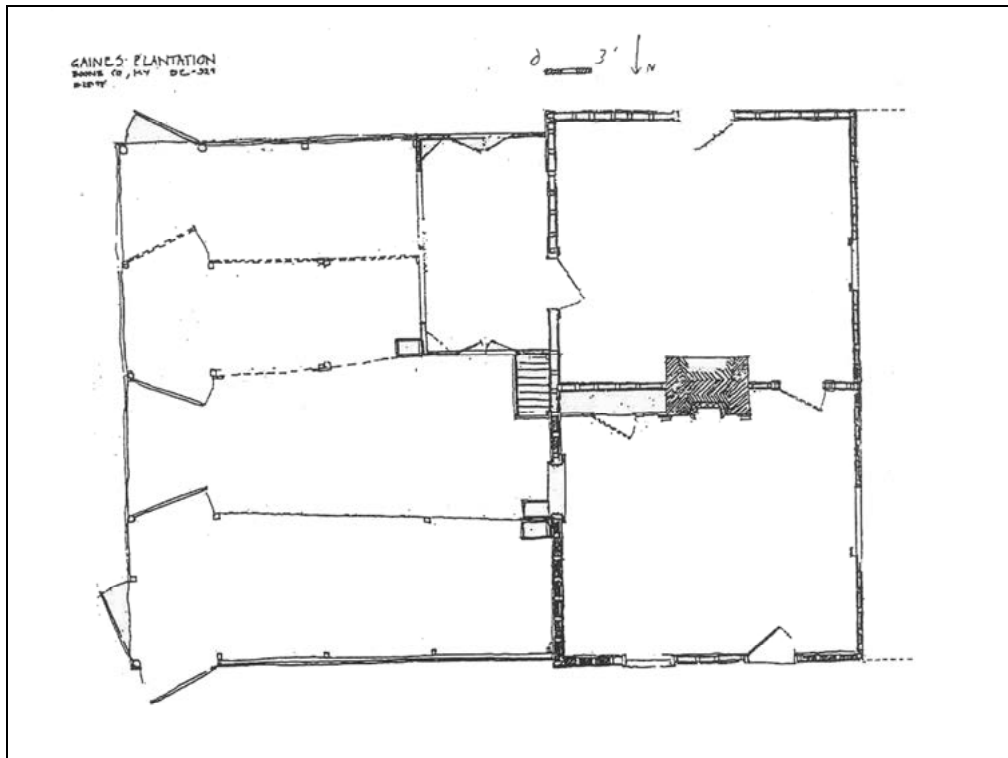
Floor Plan of Two-Room Frame Structure, with Shed Additions.
